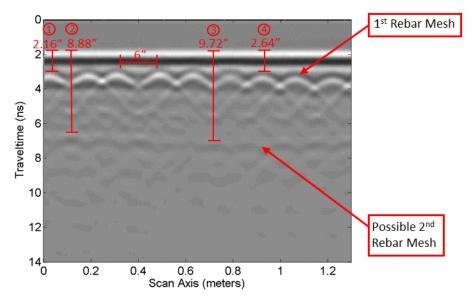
GPR Image (File 134), corresponds to a GPR scan on Area 1 on Bridge 77. Parallel to steel bridge deck girder.
